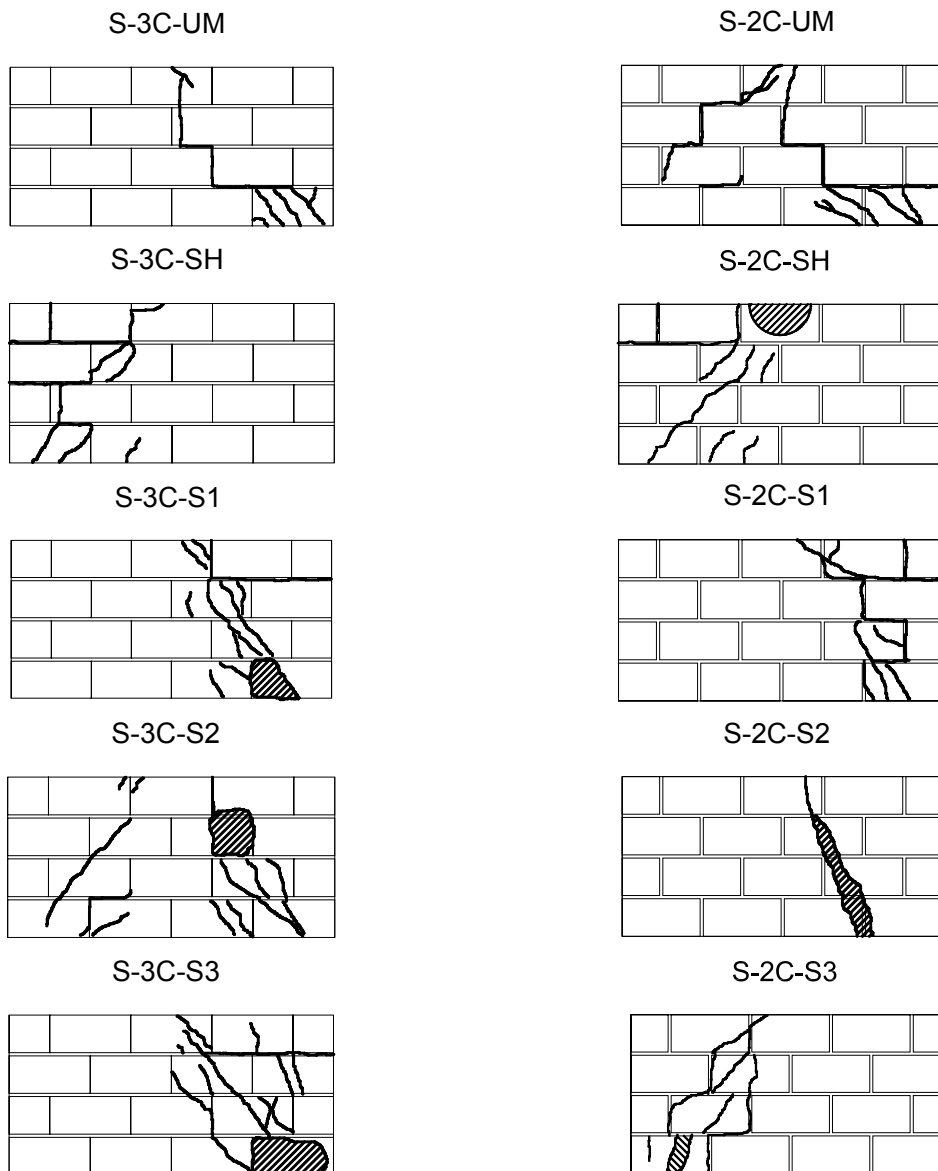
Crack patterns of masonry beams tested according to the three point load configuration.
